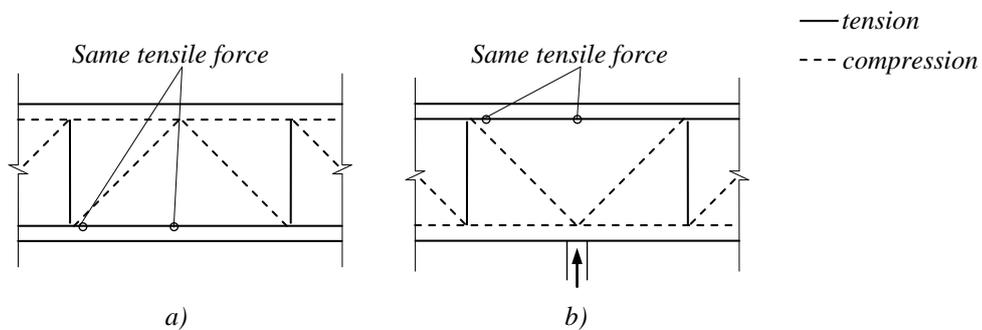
Truss model of beam subjected to bending moment, a) maximum moment section in span, b) maximum moment section at support. The figure is based on Engström (2011a).
